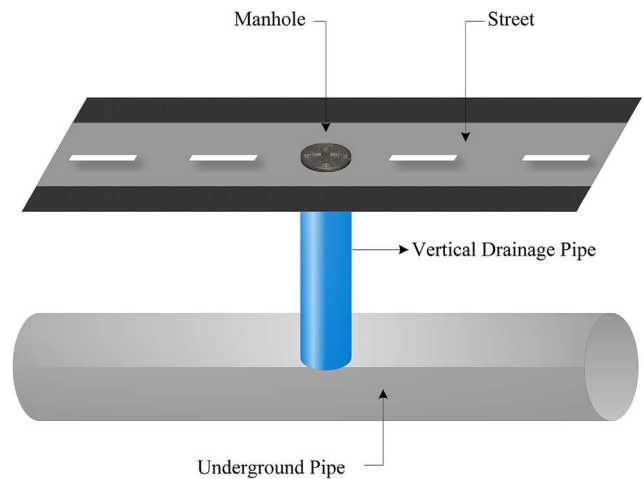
Schematic presentation of the linkage via a manhole of an urban street and underground sewer pipe.
